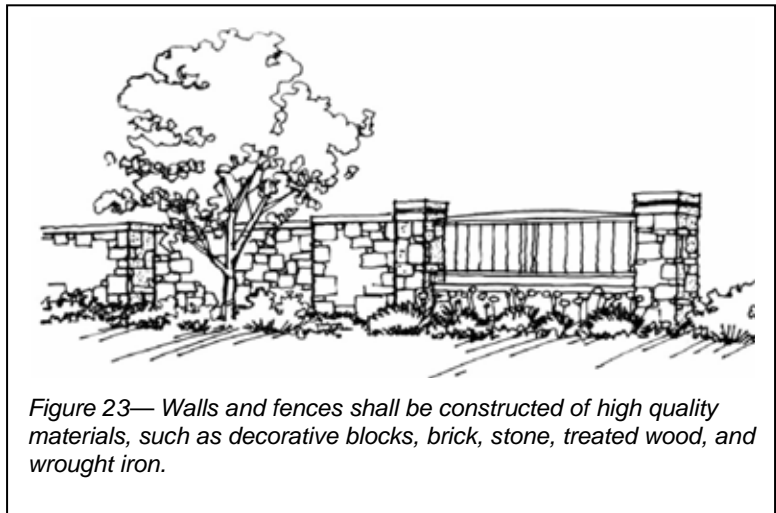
Walls and fences shall be constructed of high quality materials, such as decorative blocks, brick, stone, treated wood, and wrought iron.
